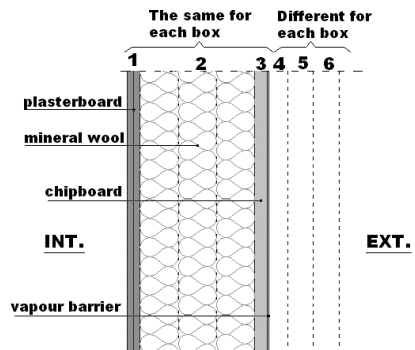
Portion of south walls common to all the boxes (first three layers facing the interior).
